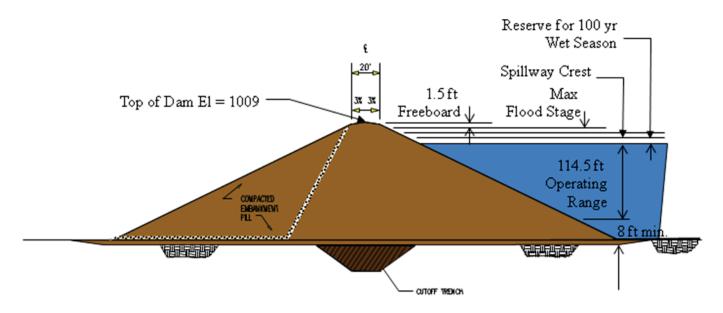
Typical Cross-Section of the Embankment for the El Dorado Hills Site
